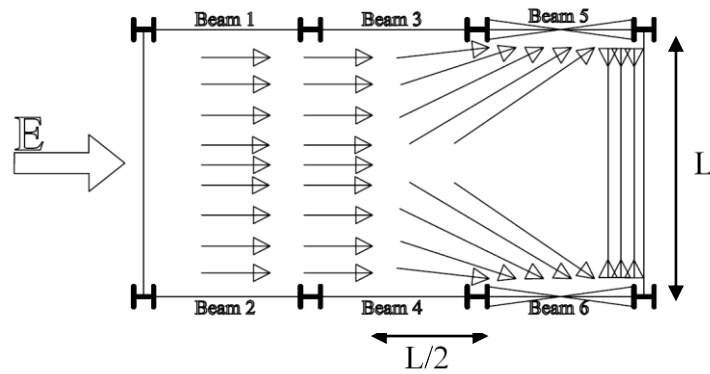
Typical floor plan with braced frames if shear studs are only provided on beam 5 and 6
